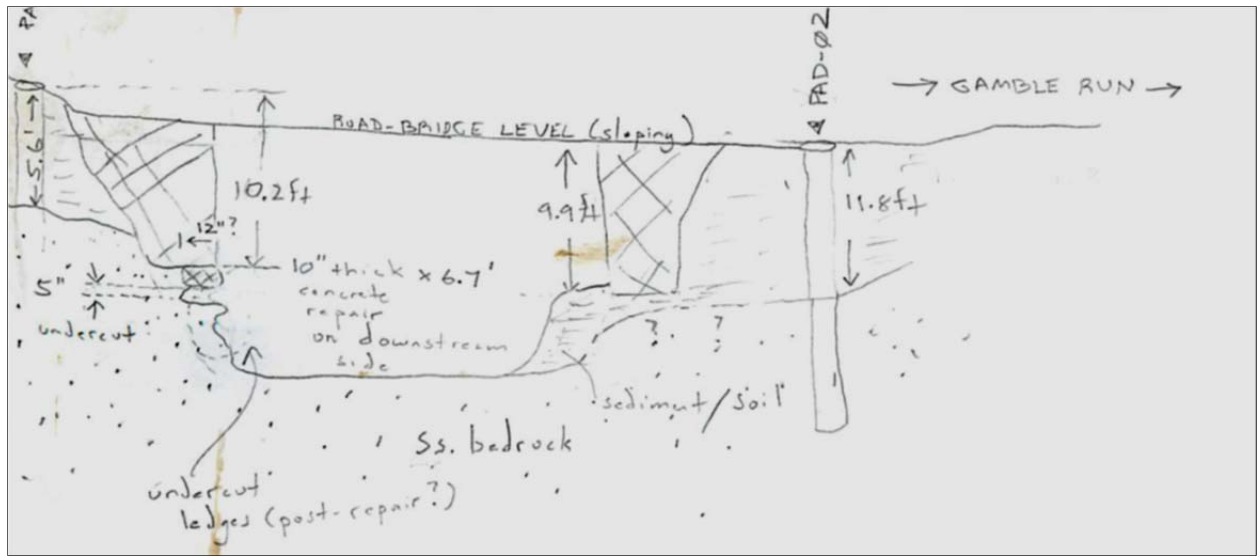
Field sketch of Paden Fork Bridge, looking downstream.
